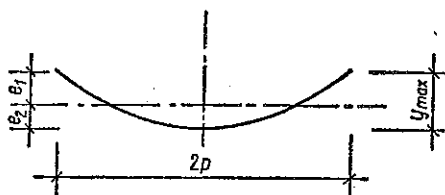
Arc-shaped cross-section of a shell-beam [2].
